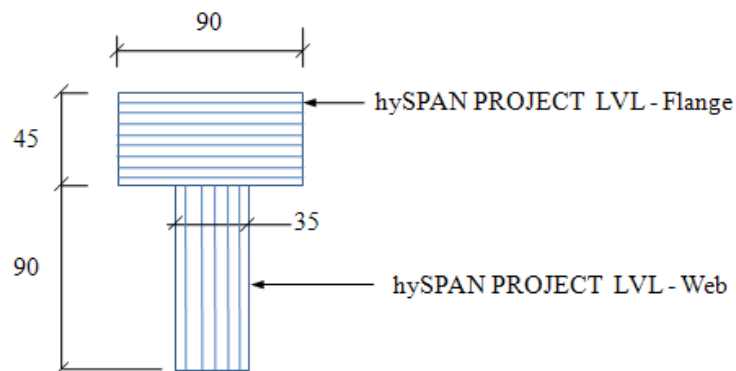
Cross-sectional dimensions of laboratory timber composite beam (mm).
